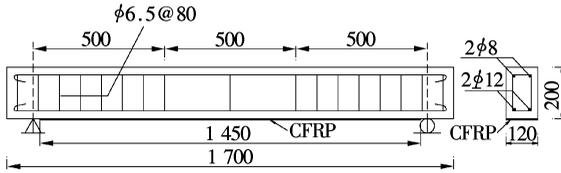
Dimensions and reinforcing details for beams (unit: mm)
